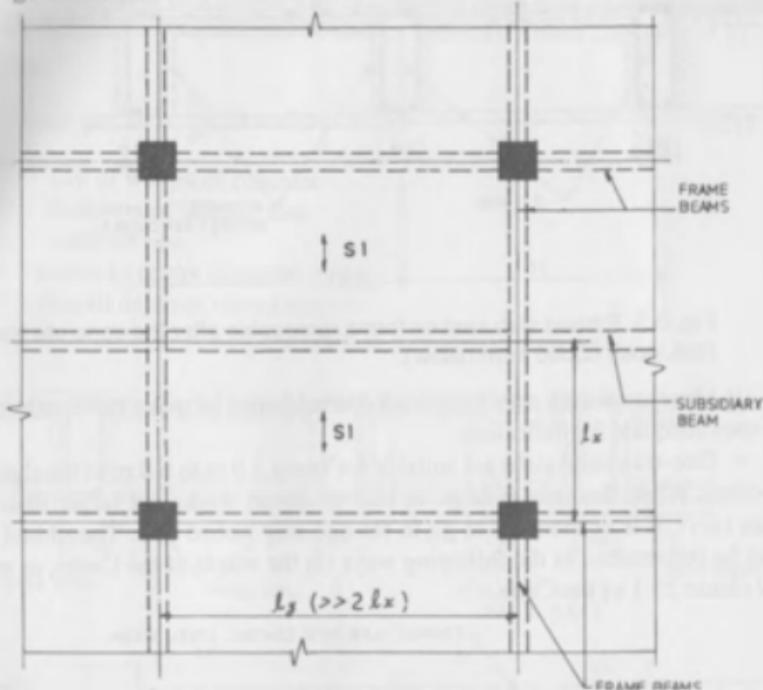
Arrangement of one-way slab panels in a floor plan.
